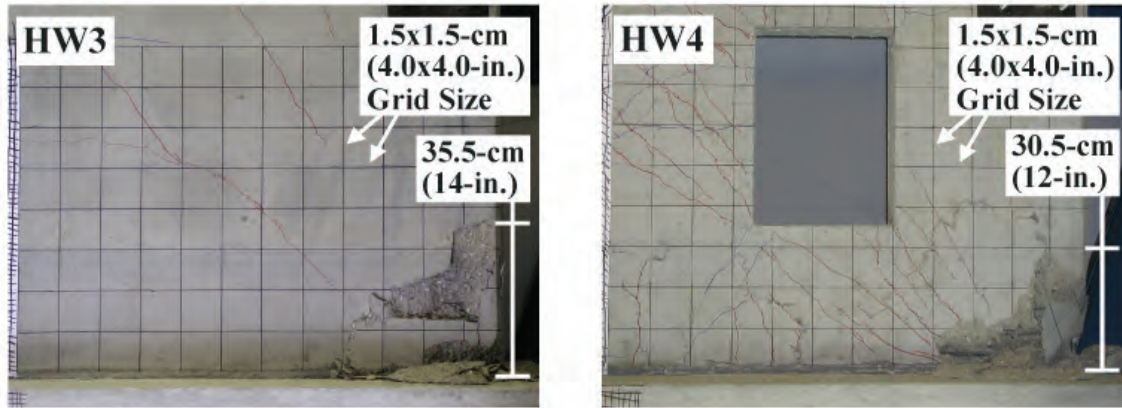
North Toe at Base of Specimens HW3 and HW4
